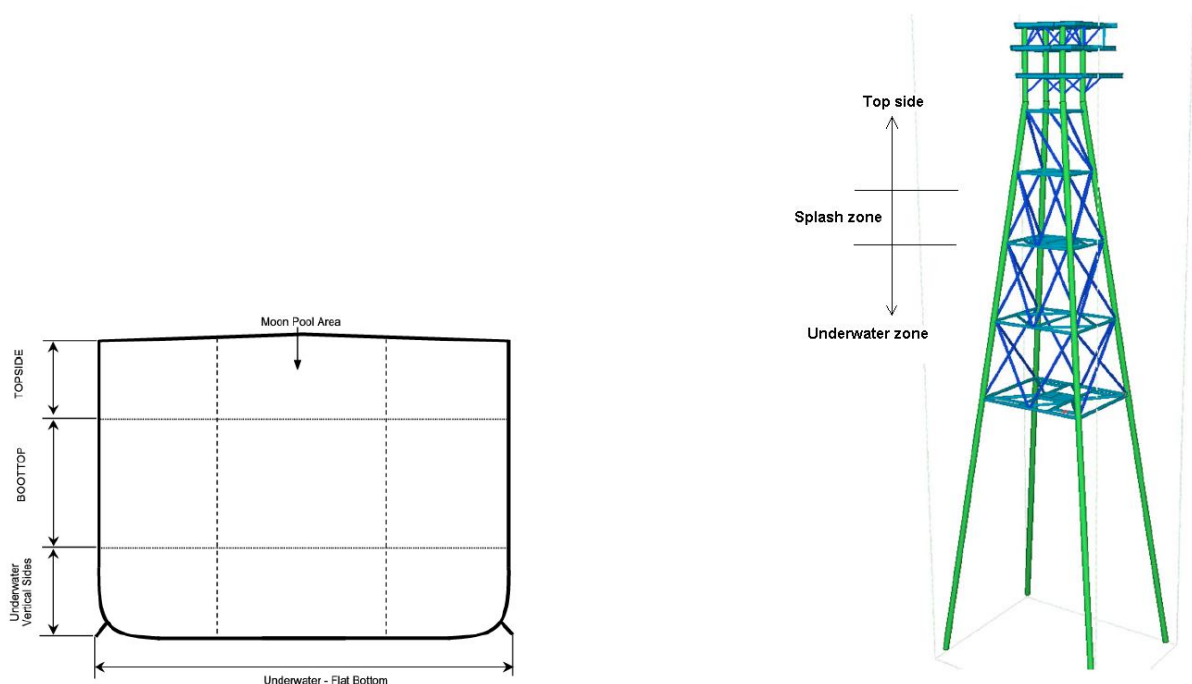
Schematic Drawing of Hull (left) Schematic Drawing of a Fixed Platform, Jacket Type Structure (right).
